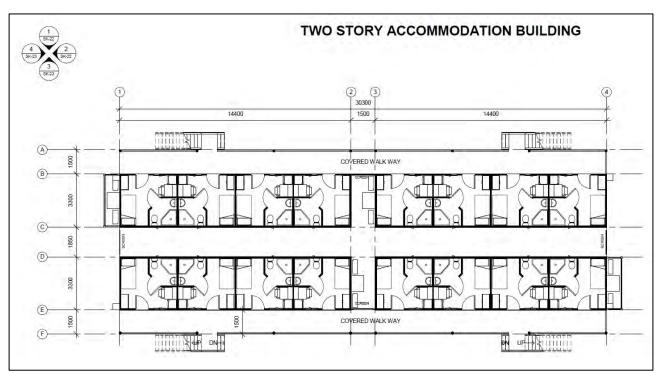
Two Accommodation Building – Floor Plan (Source: Application Material)
